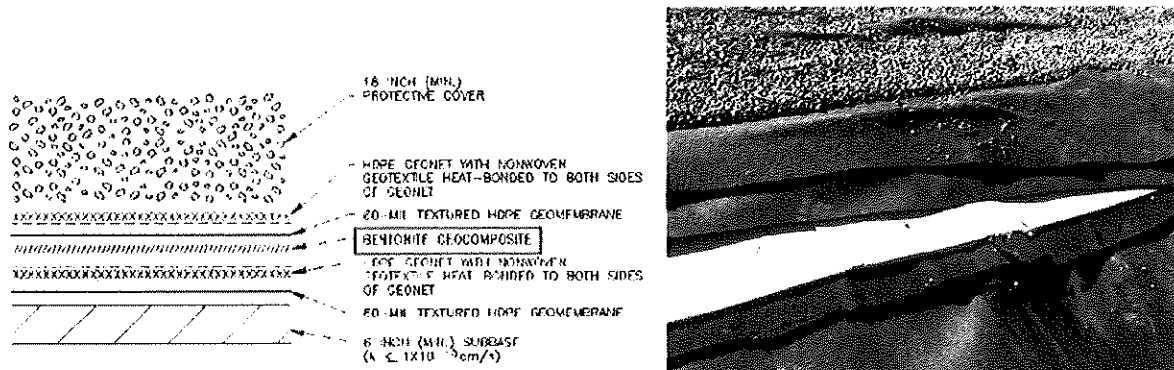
Cross-section of liner system in slope failure area and photograph of liner system components after waste excavation.
